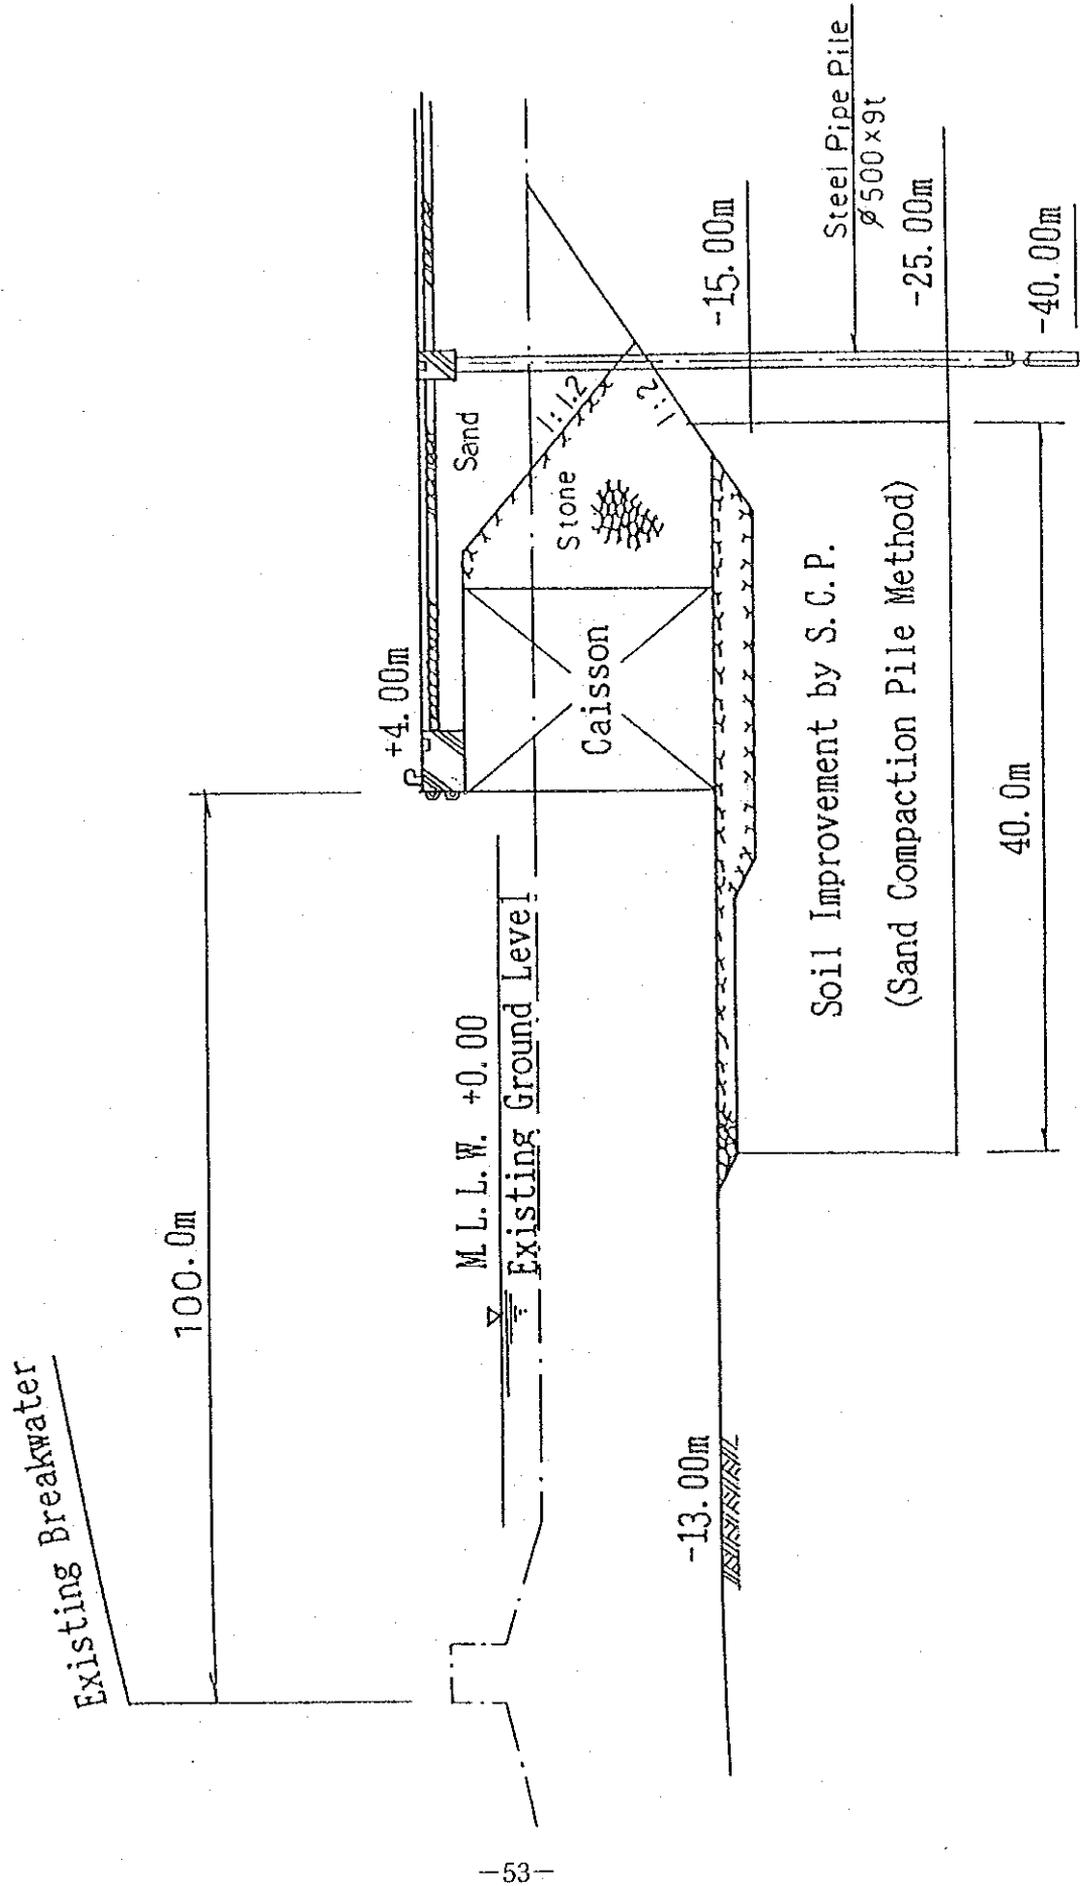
Typical Cross Section of -13m Container Berth at Manila South Harbor
